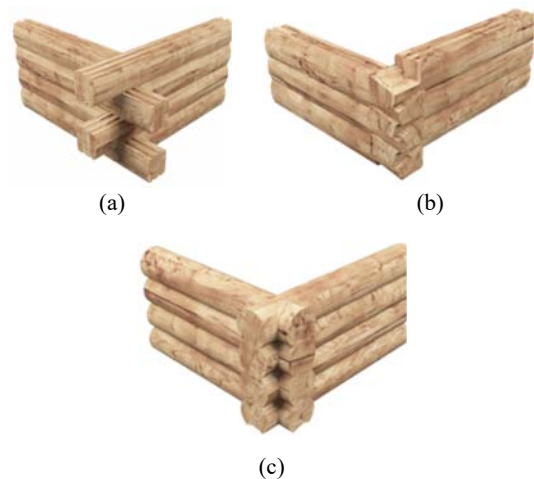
Common corner joint used in log-walls a) butt and pass corner style b) dovetail joint c) interlocking corner
